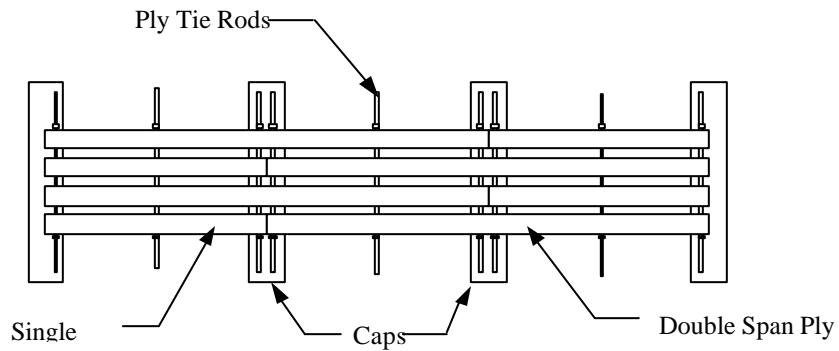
4-Ply Configuration for the 3-Span Bridge Chord
